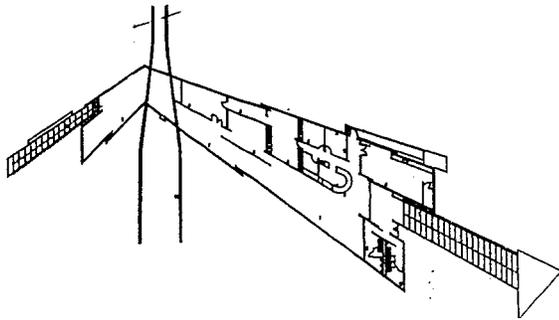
Deer Valley Rock Art Center Floor plan. Courtesy of William Bruder.
